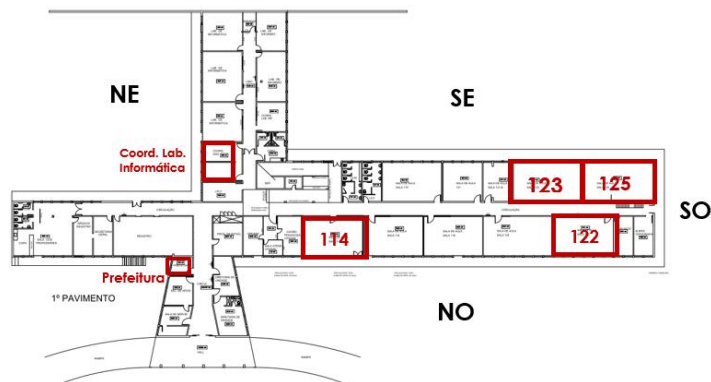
First floor plan. Source: adapted from SINFRÁ (2018)
